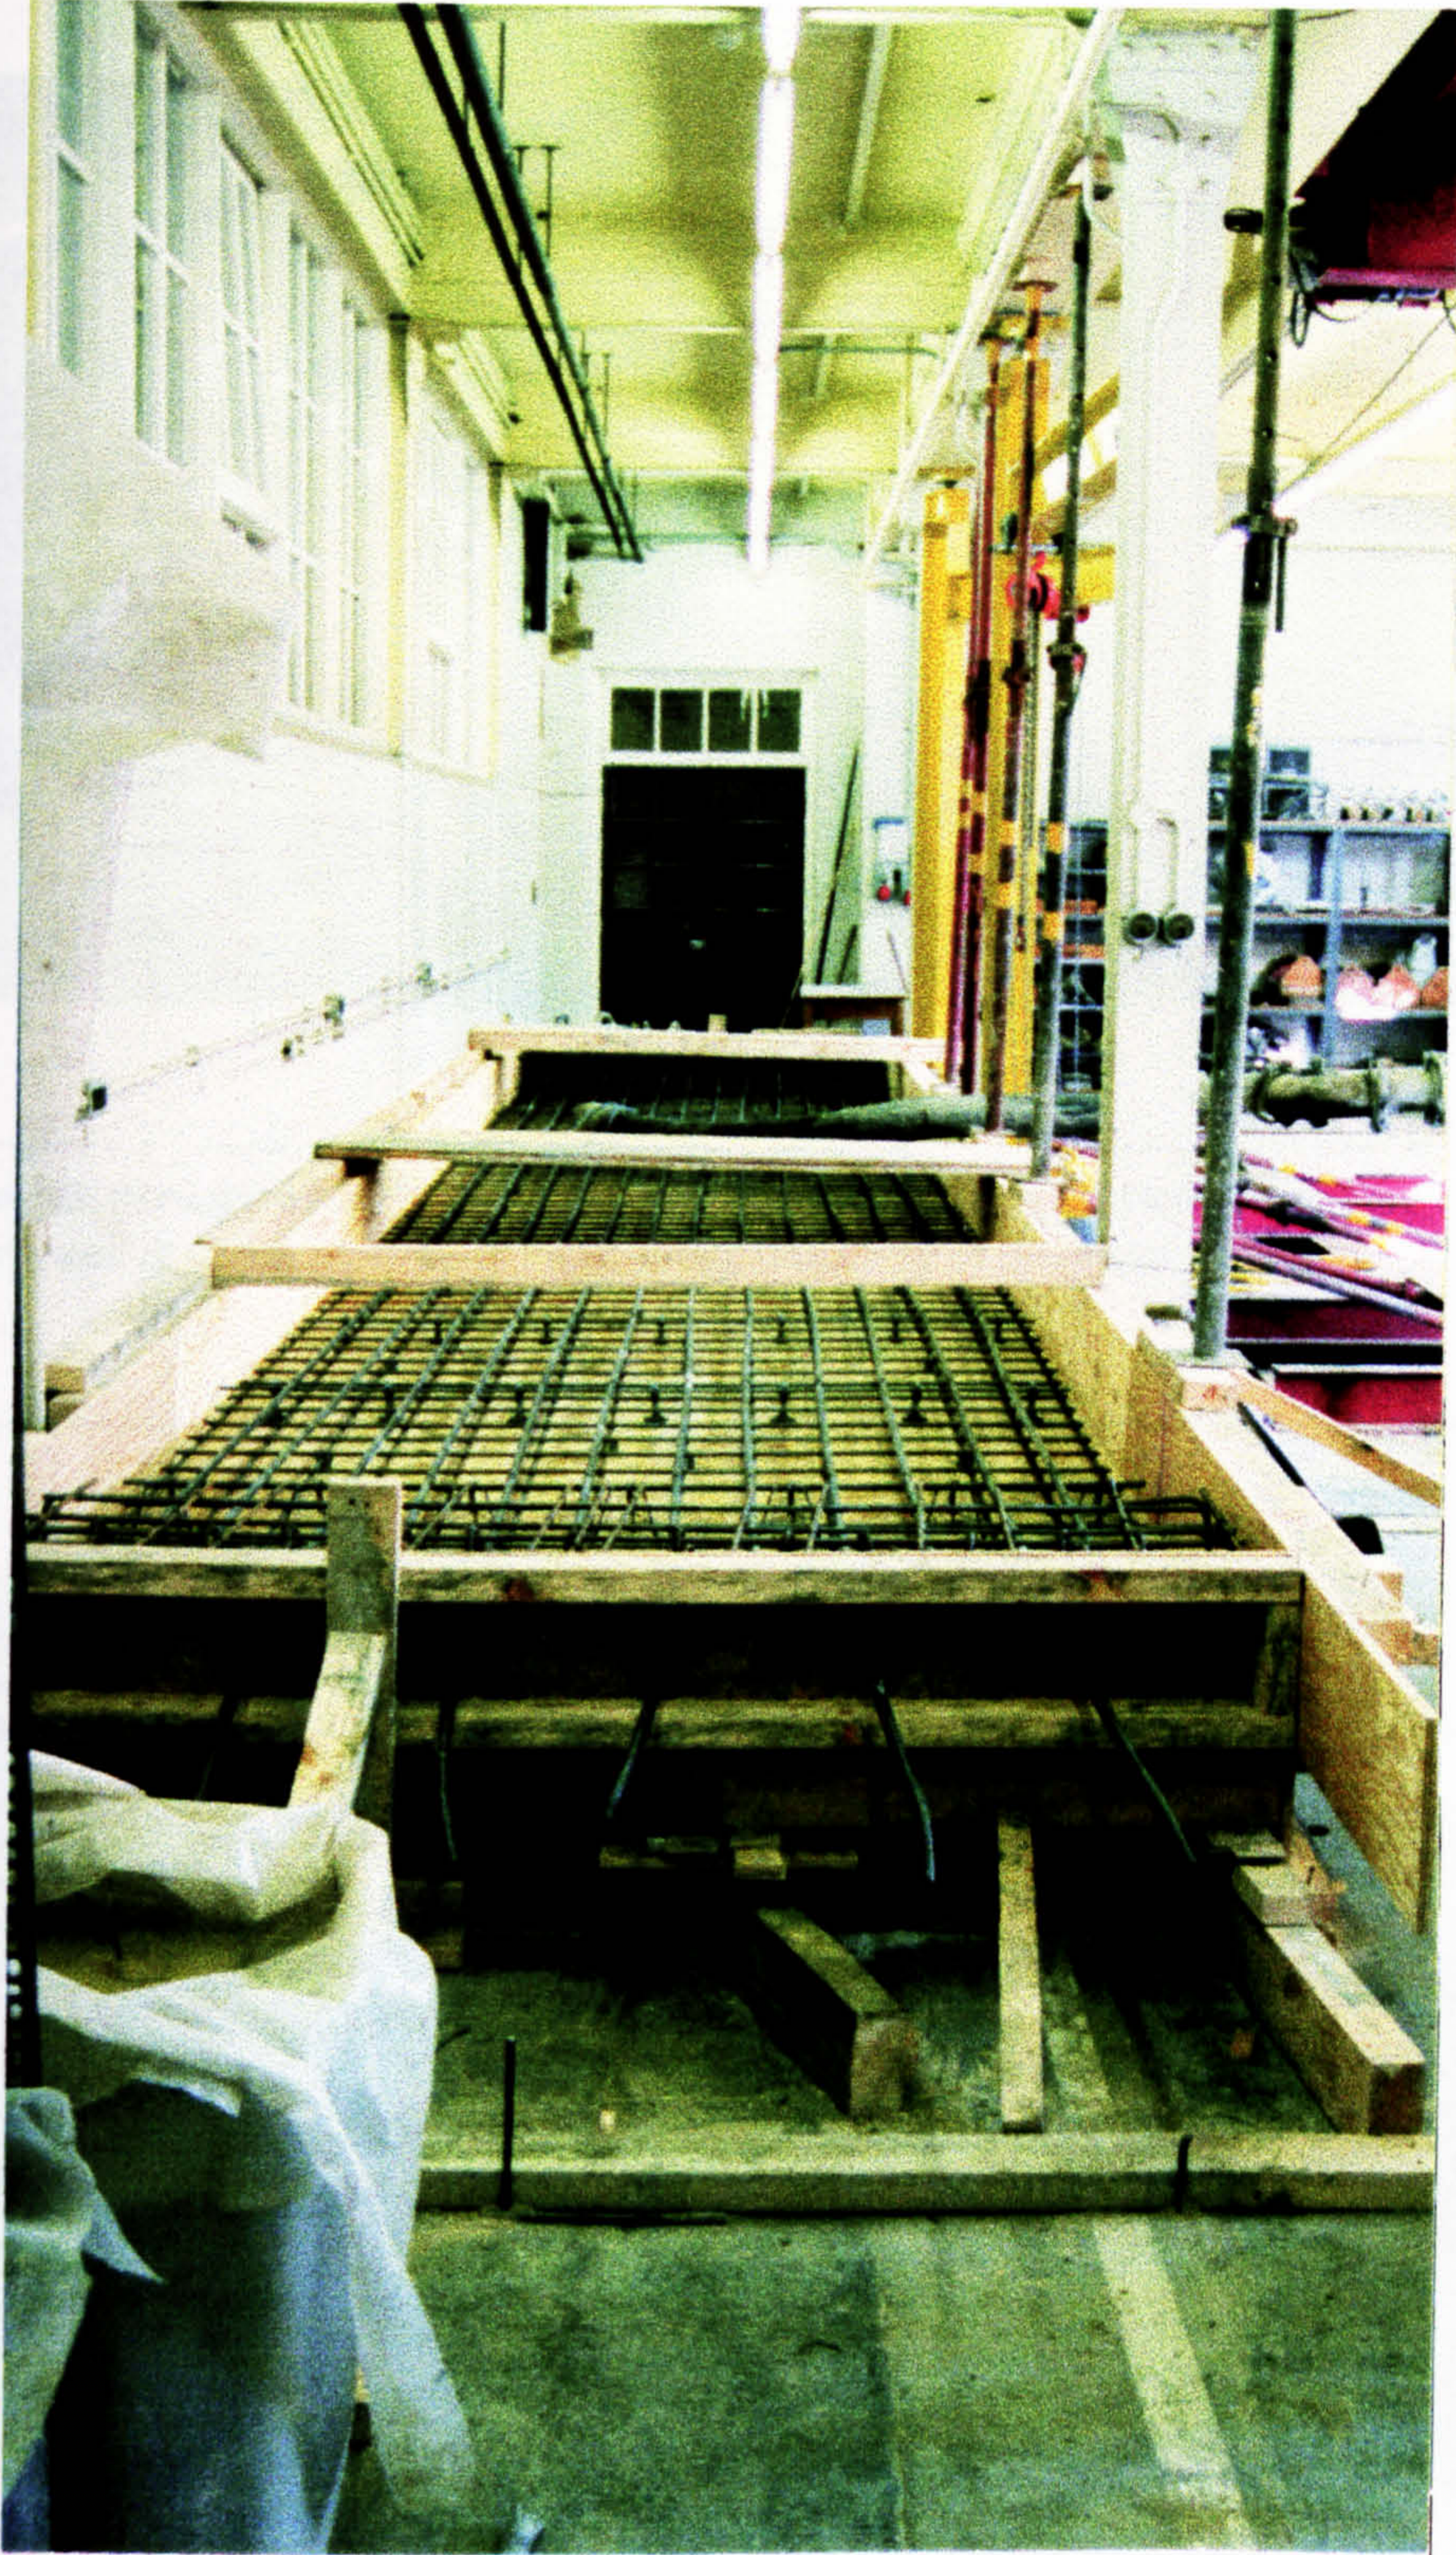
Structure A - Tendon and reinforcement placement prior to concreting.
